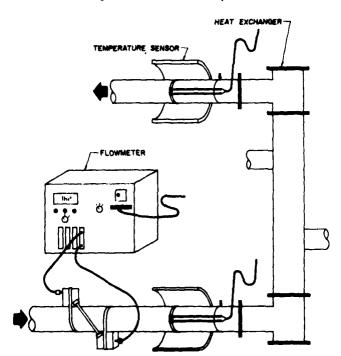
Mounting arrangement for clamp-on pipe-mounted sensors.
